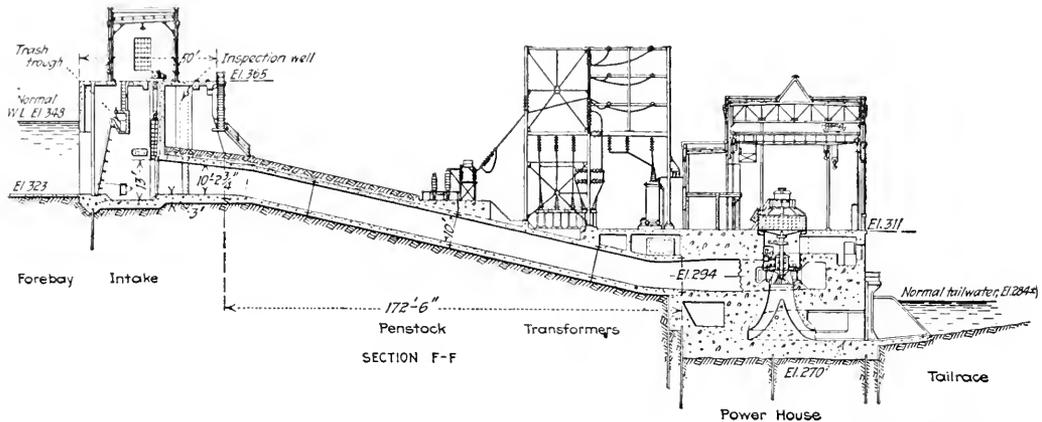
Cross-sectional Elevation through Forebay Dam, Penstocks, Outdoor Station, and Power House
